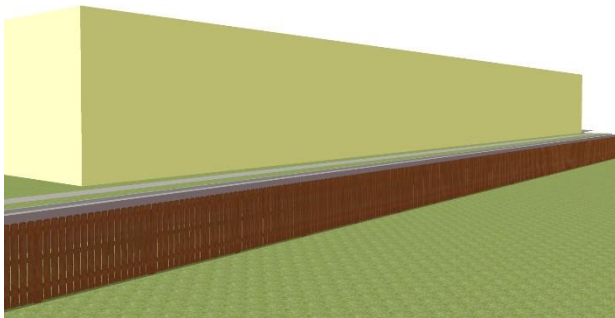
Inappropriate example of a long unbroken wall plane adjacent to a residential area.
